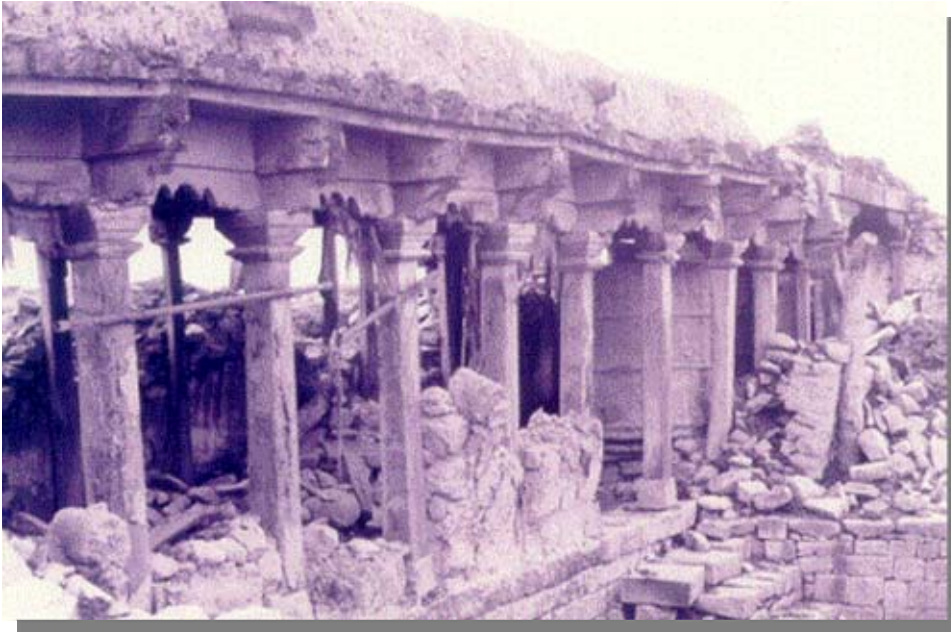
In some buildings, the traditional heavy clay roof was supported on a frame of wood posts and beams. In most cases, the timber columns continued to hold the roof together while the walls collapsed, generally outwards from the timber frame, saving the lives of many occupants
